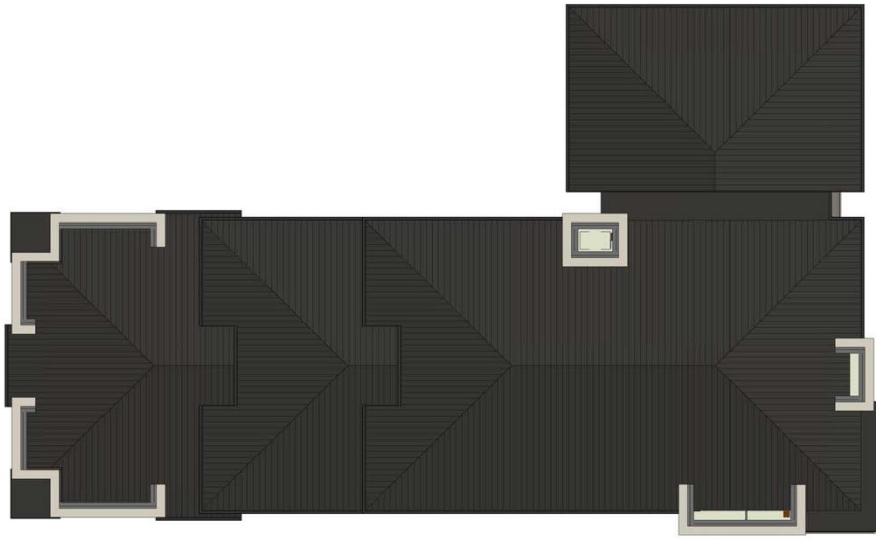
The roof plan of Building B03 (Ryman Drawing A1-010 RC20).
